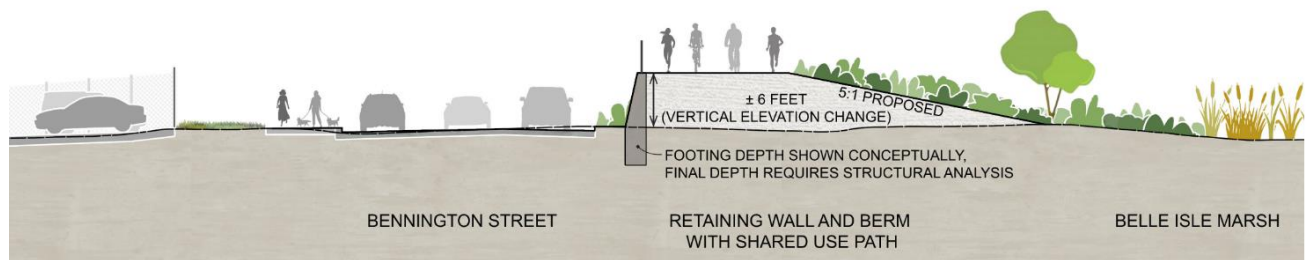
Alternative BS-2B: Living Levee with Shared Use Path and Retaining Wall—Illustrative Cross-Section (Terraink)
